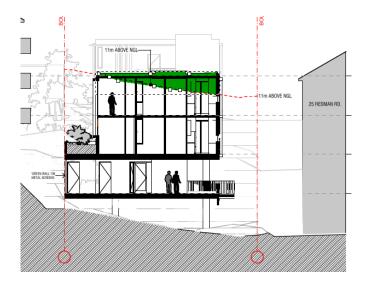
Extract from proposed plans, long and cross section of building height plans and height blanket on 3D Model - Source Mackenzie Architects
